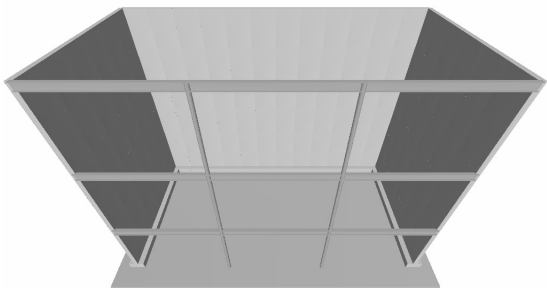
Model of U-Shaped Wall 7.200 m x 14.400 m.
